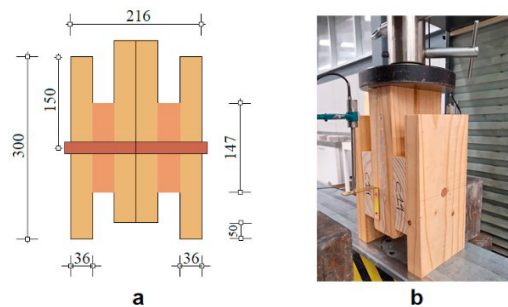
Shear properties of ShDCLT connections. (a) Specimen dimensions (mm); (b) Test setup.
